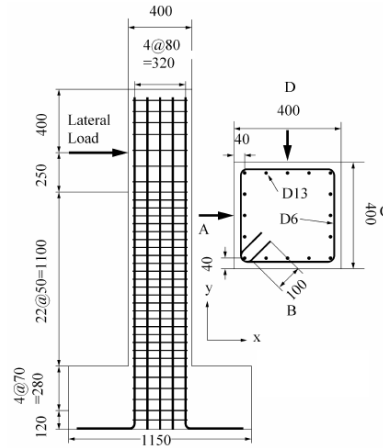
Cross-Section of the tested RC column and its dimensions [12]
